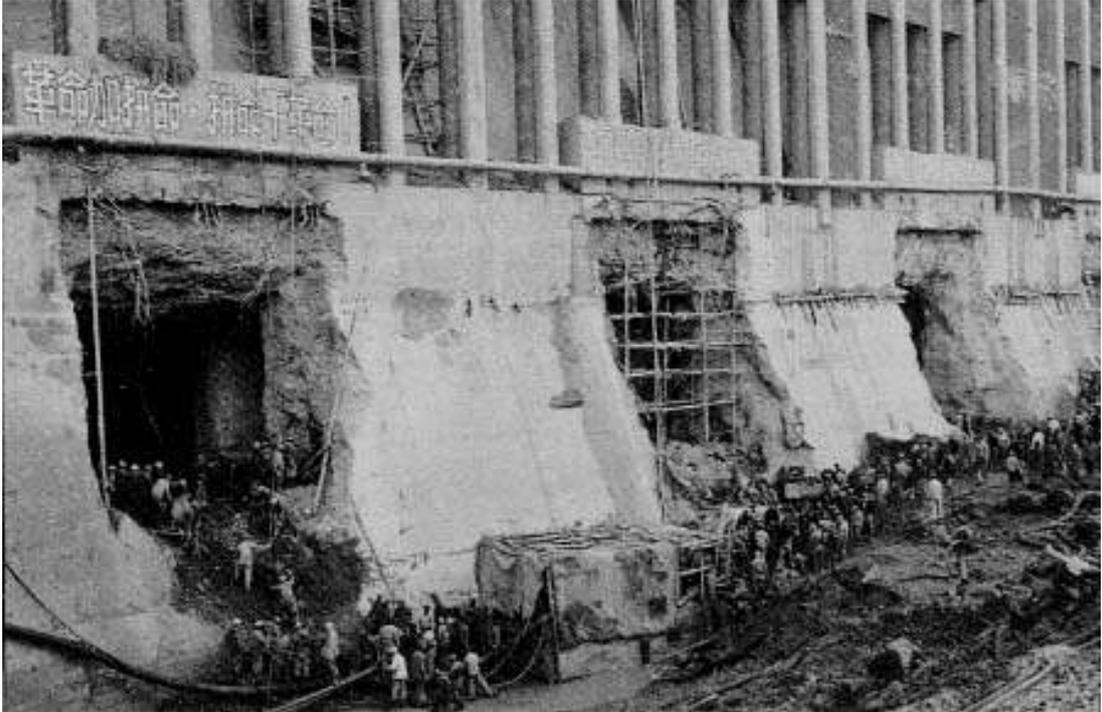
Reconstruction of the bottom outlets at Sanmenxia Dam
